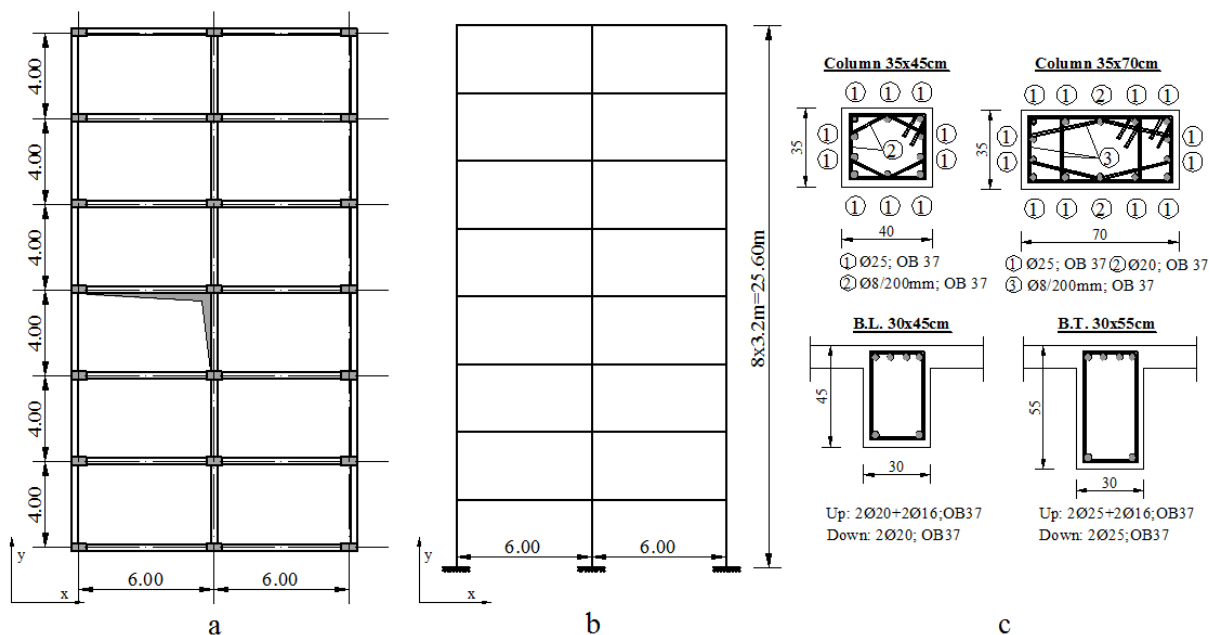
Structural systems: a) Plan view; b) Elevation view; c) Cross sections for structural elements.
